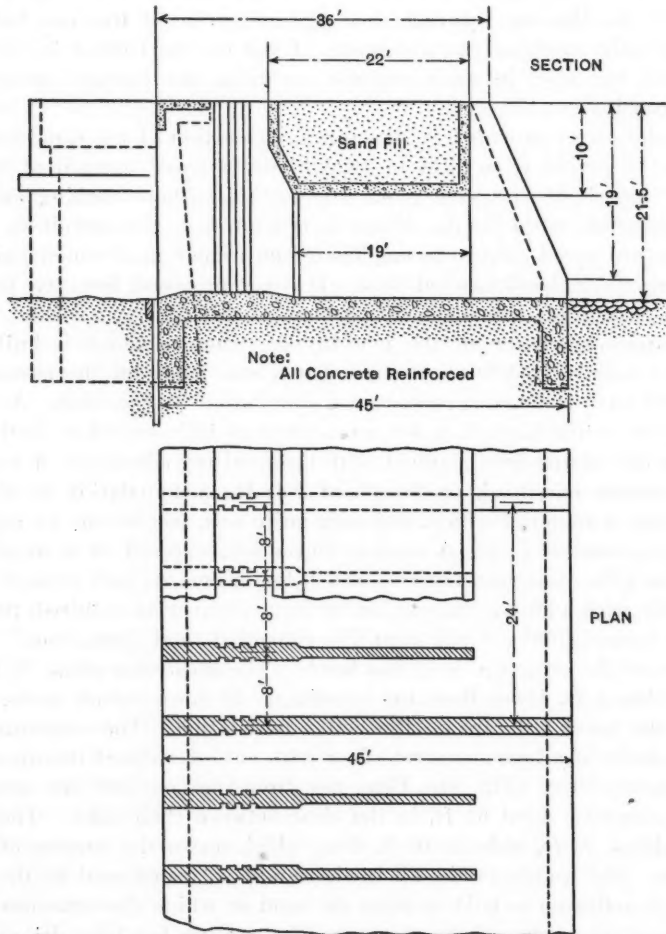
PLAN AND SECTION, ROCKWOOD GATE AT HEAD OF THE IMPERIAL CANAL, CALIFORNIA, BUILT 1918.
